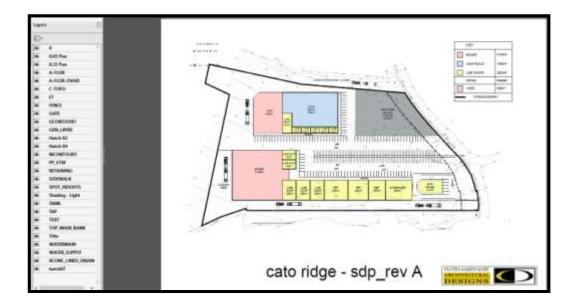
Detailed design of the Proposed Cato Ridge Ayanda Shopping Complex and filling station
